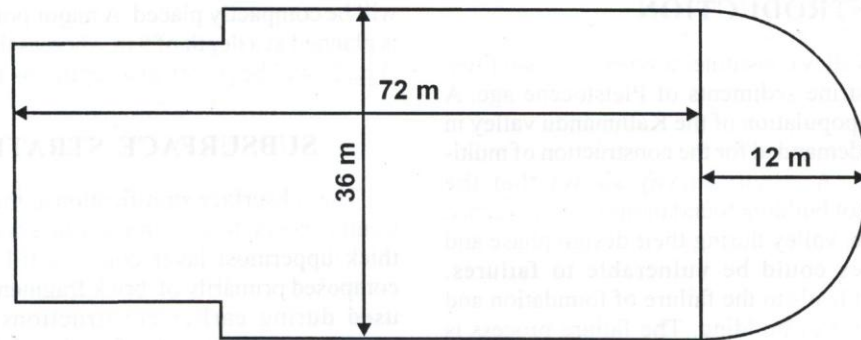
Simplified plan of foundation (Modified from HSCC 2007)
